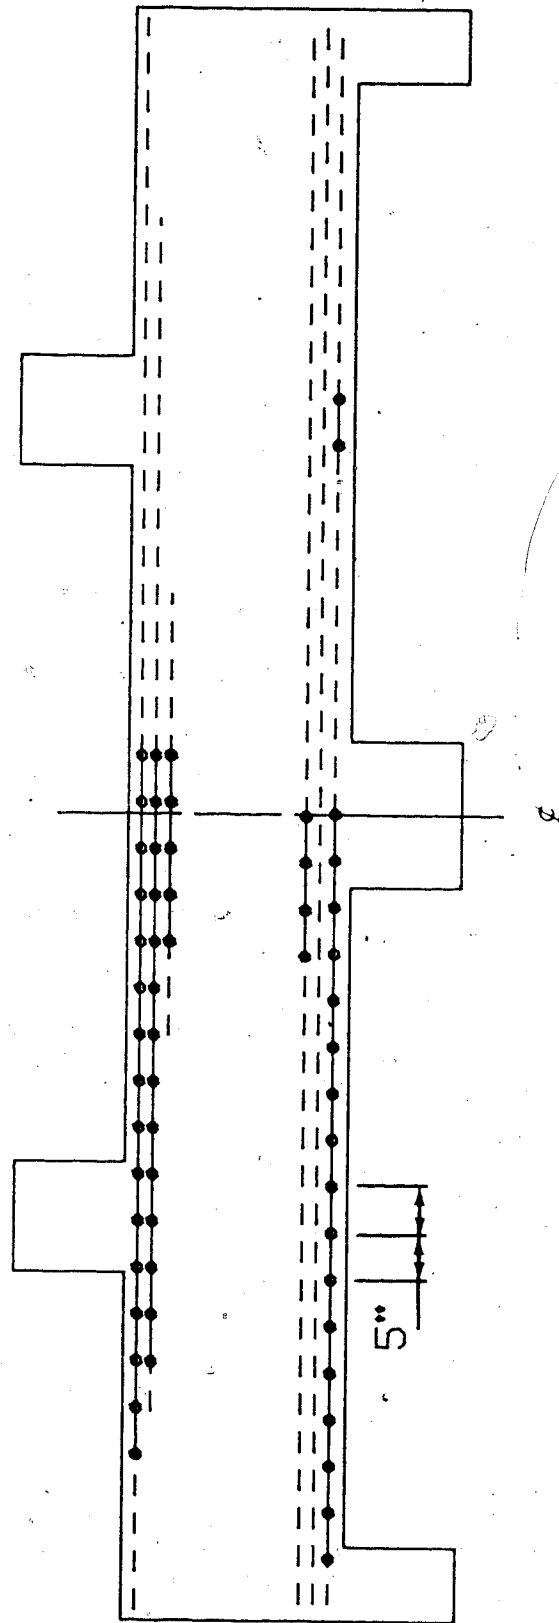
Location of Instrumentation of Steel Strains in Beam No. 1
